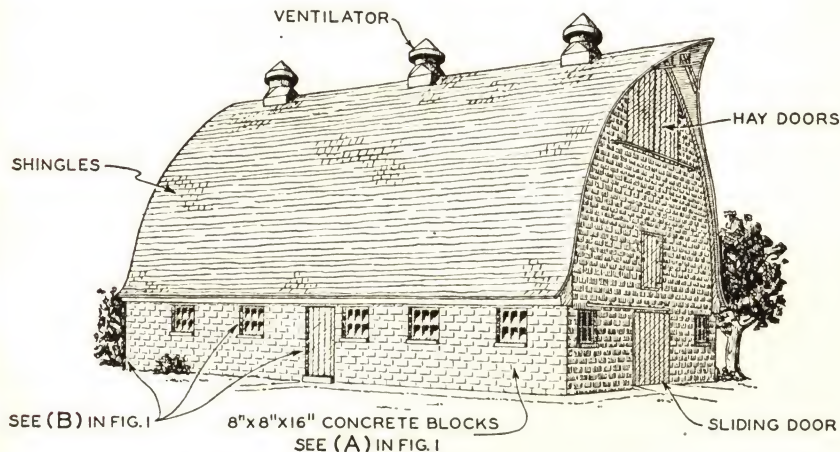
Dairy Barn Constructed of Concrete Masonry
